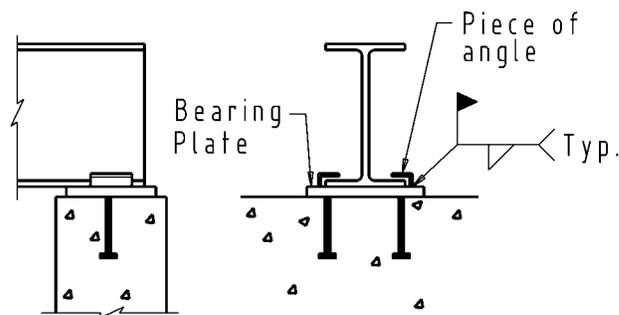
Detail to permit the beam to slide while restricting any other type of movement.
